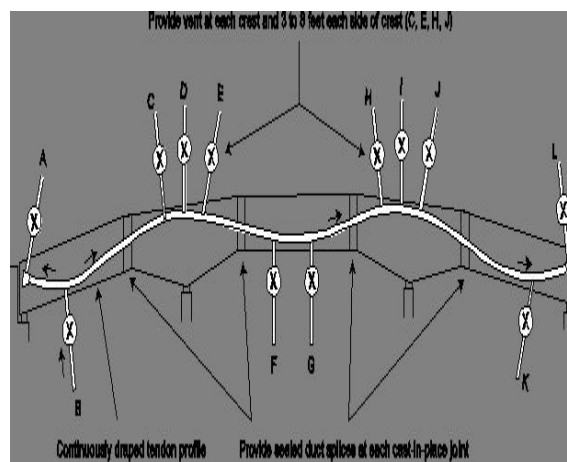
Grouting details for a 3-span, drop-in and spliced girder duct system
